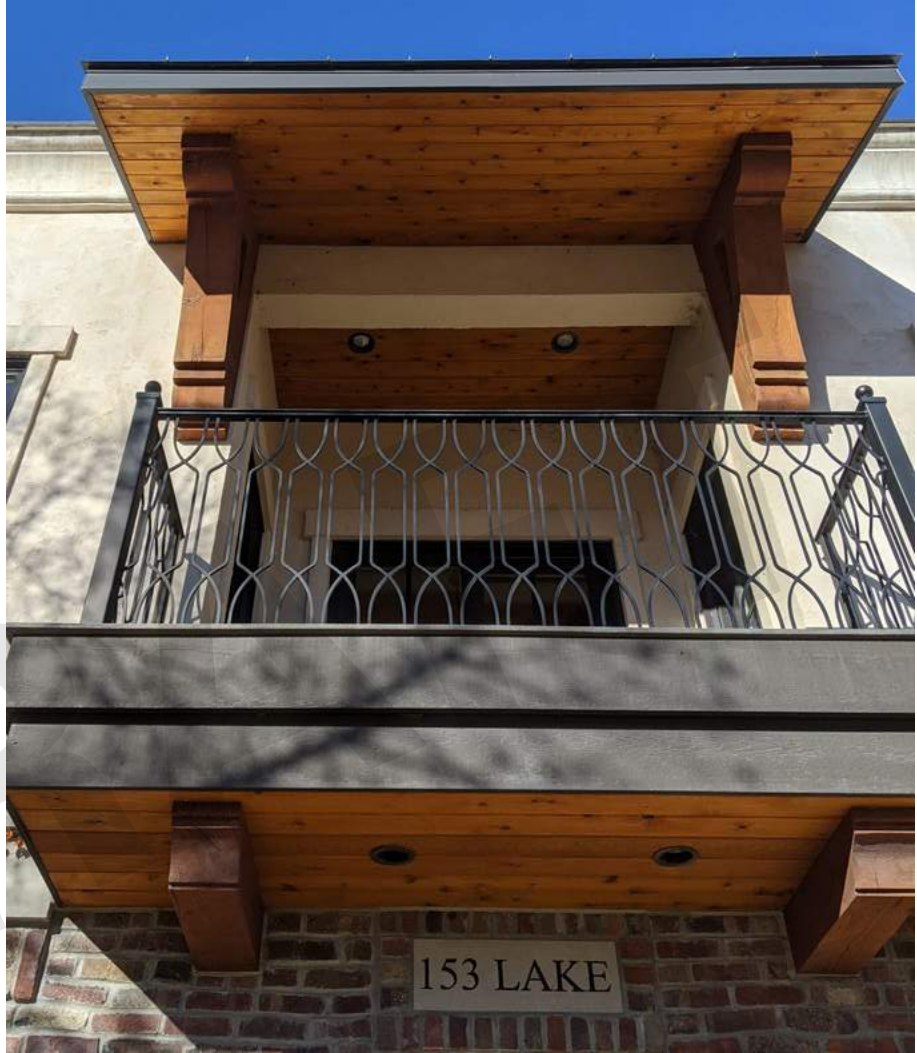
Balconies should be constructed of high quality materials and provide thoughtful detailing for railings, soffit, and posts or corbels.
